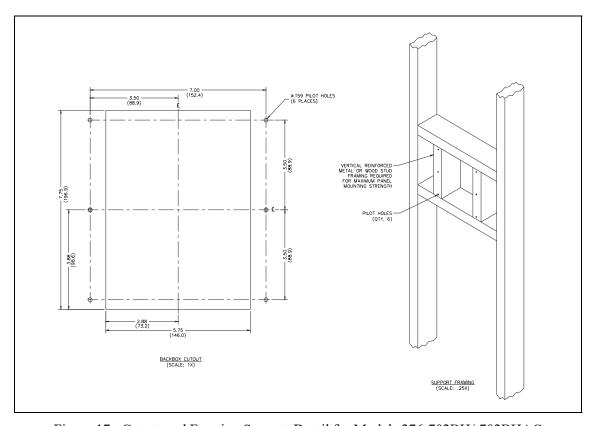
Cutout and Framing Support Detail for Models 276-702BH/-702BHAC
